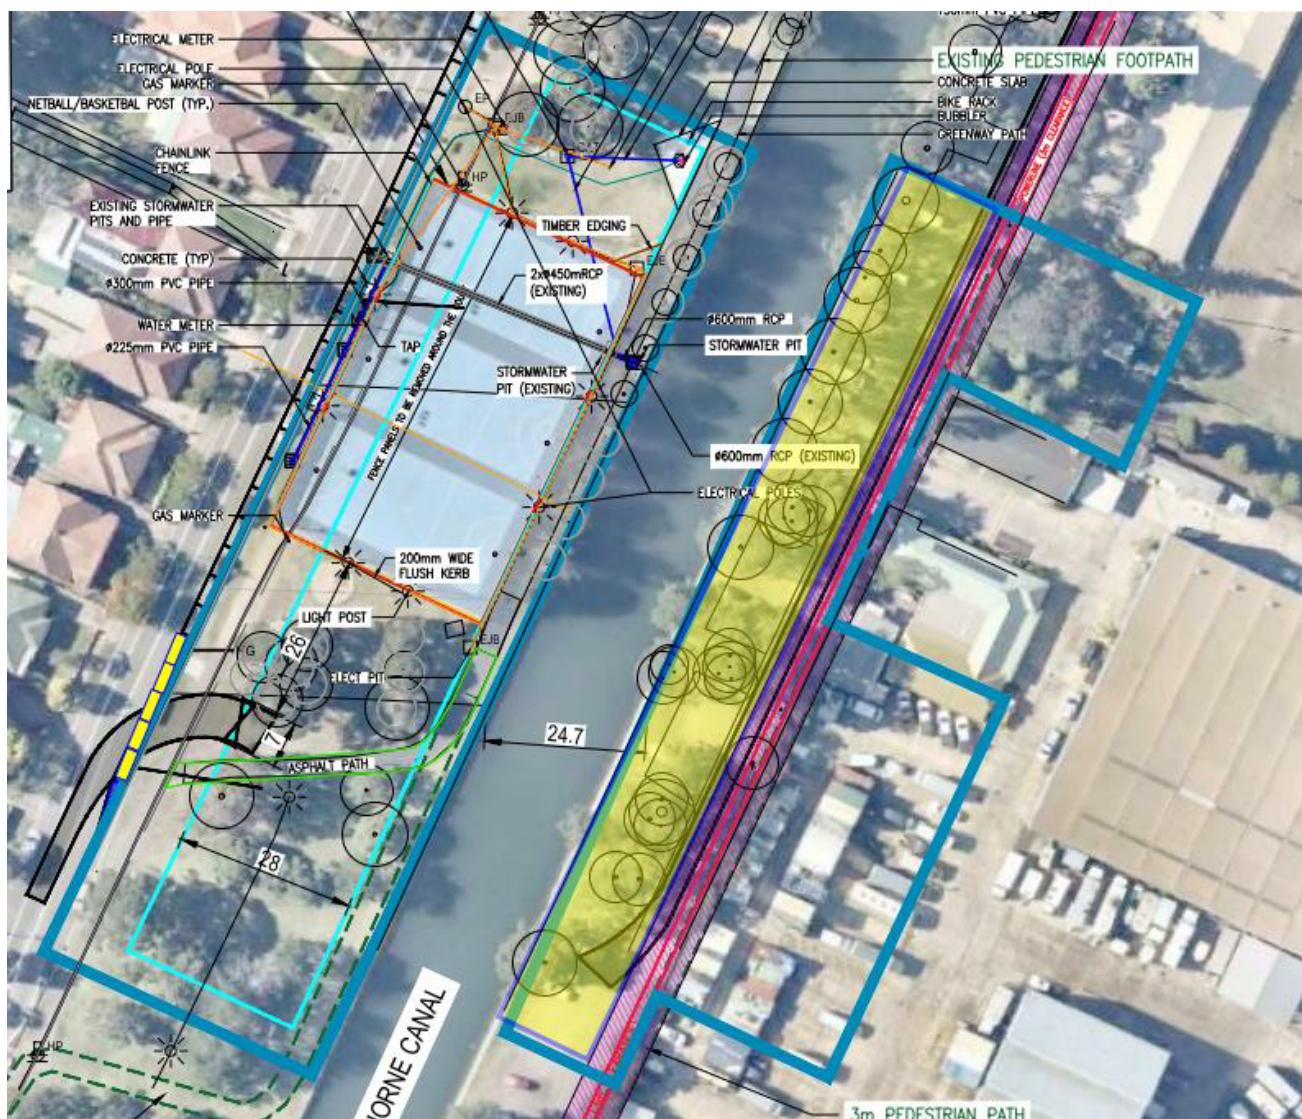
Canal Road and Hawthorne Parade Surface Grouting area - On-street Parking Changes (in Yellow)
